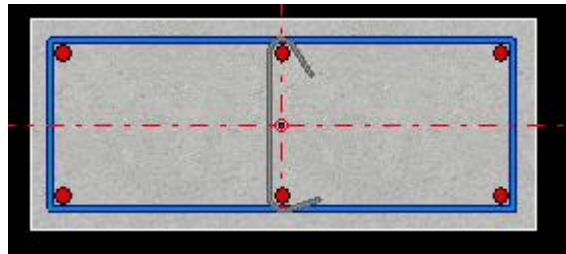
Existing steel reinforcement in 25 cm x 60 cm column
